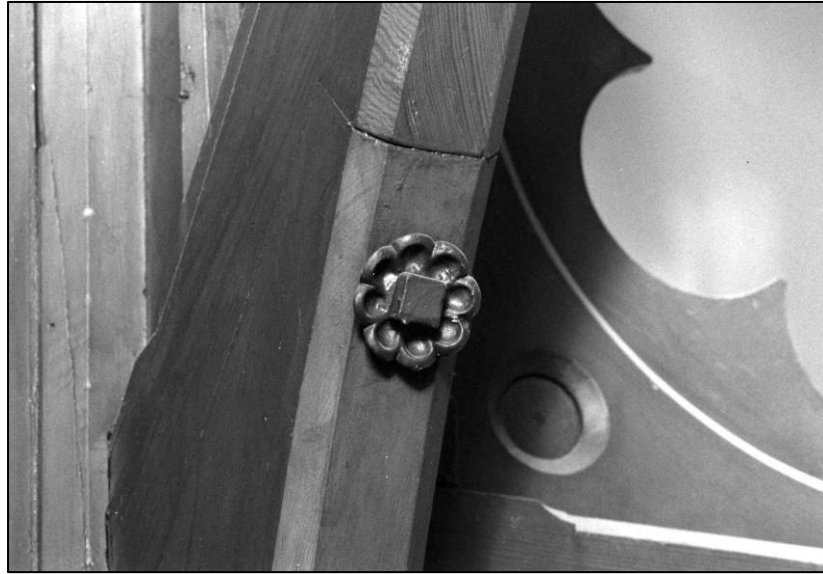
Church: 1F gallery, typical flower headed bolt to roof structure, looking NW (photo 5/1).
